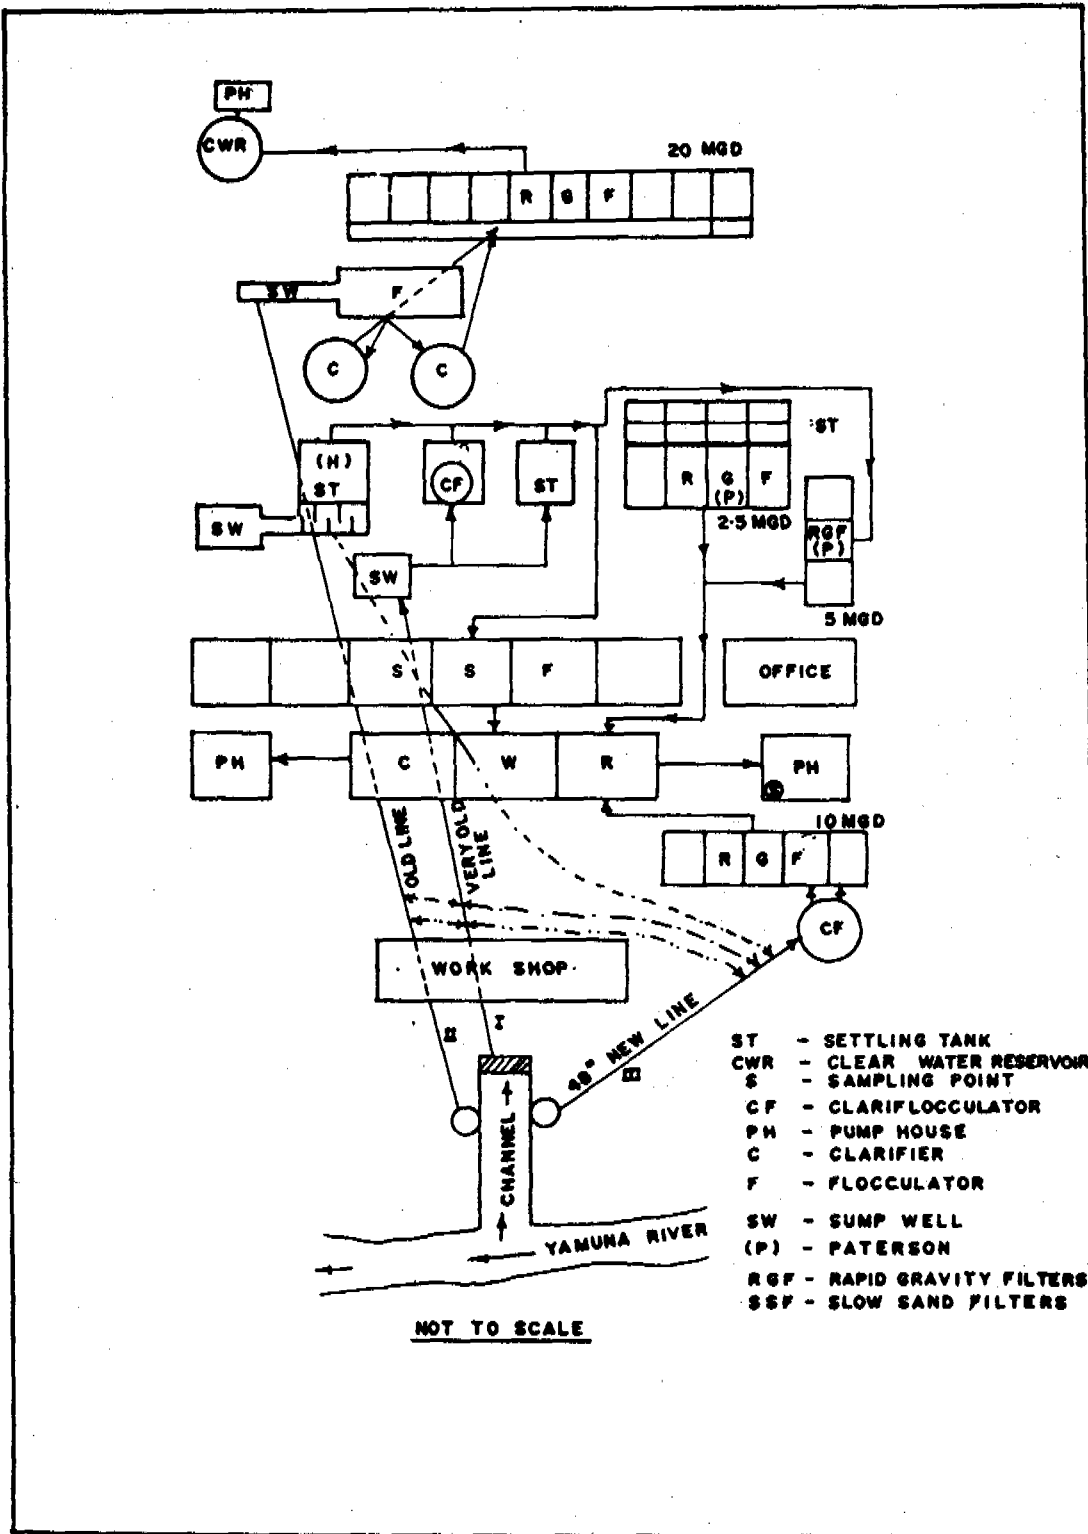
LAYOUT PLAN OF AGRA WATER WORKS
